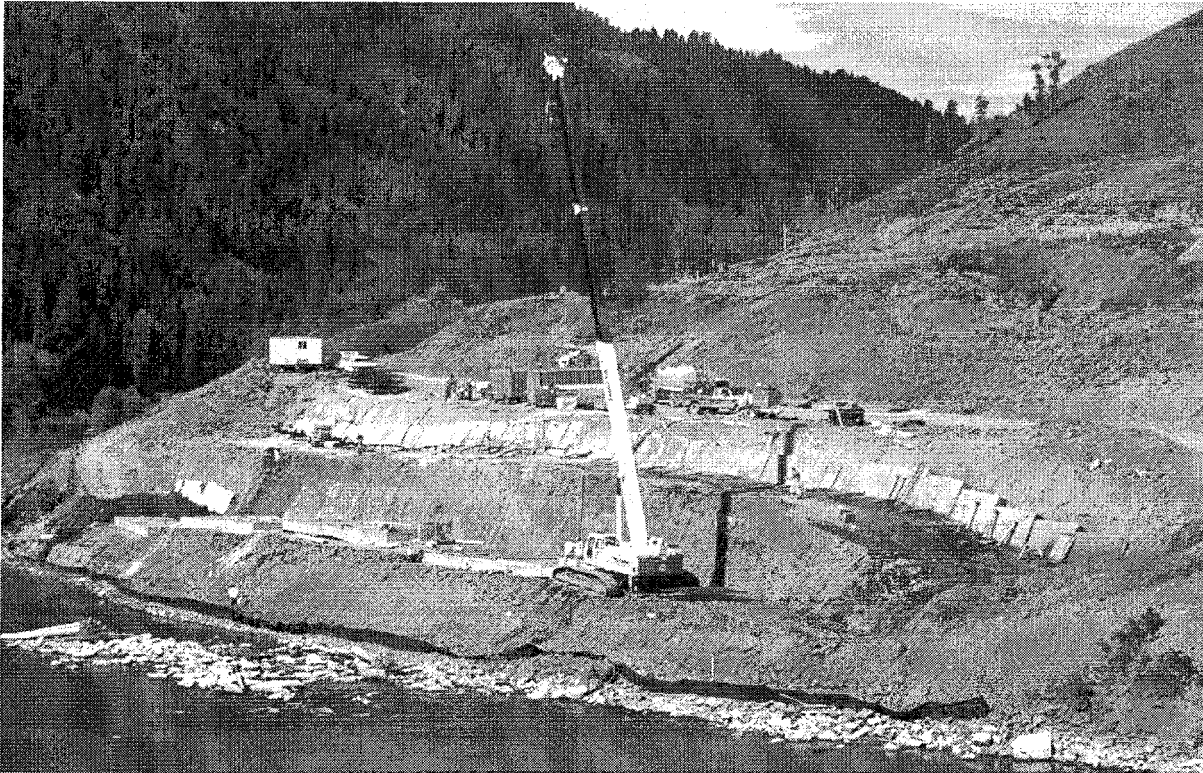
View of construction site showing cut benches and panels, Rows A and B.
